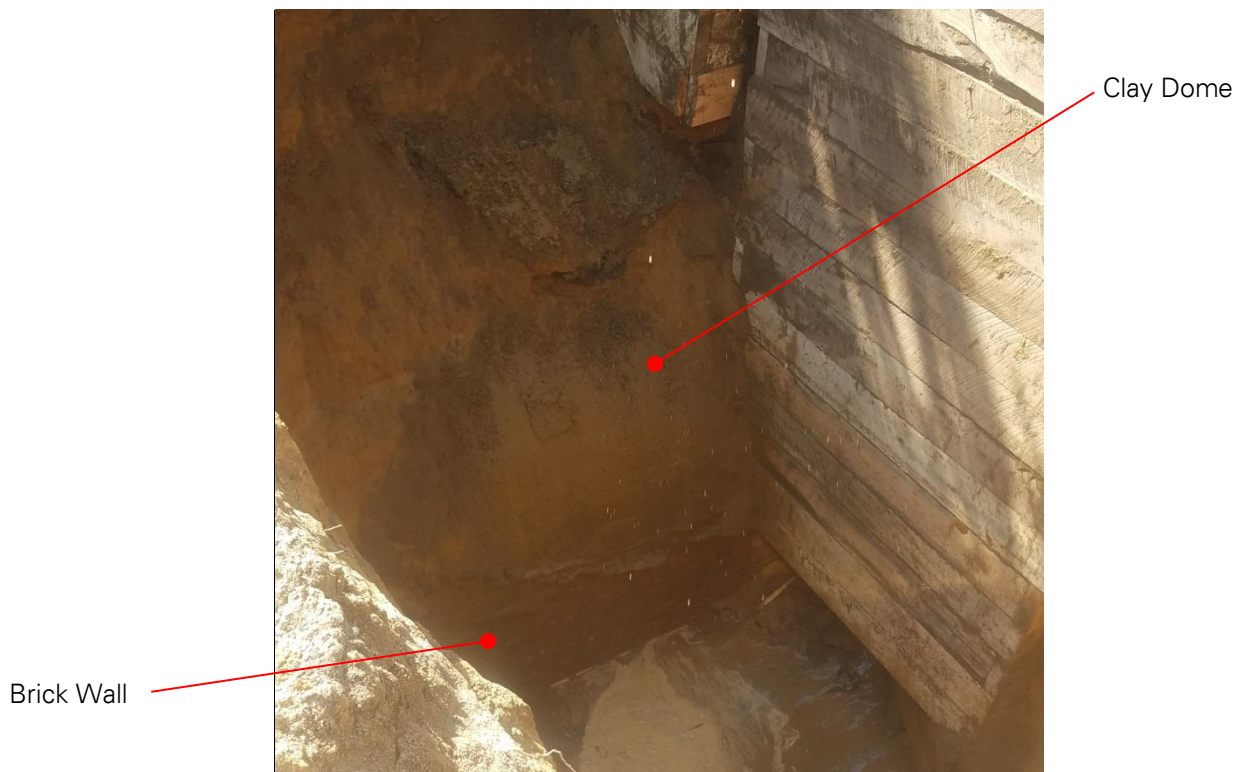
View of the clay dome and the brick wall at TP-1 (facing southwest)
